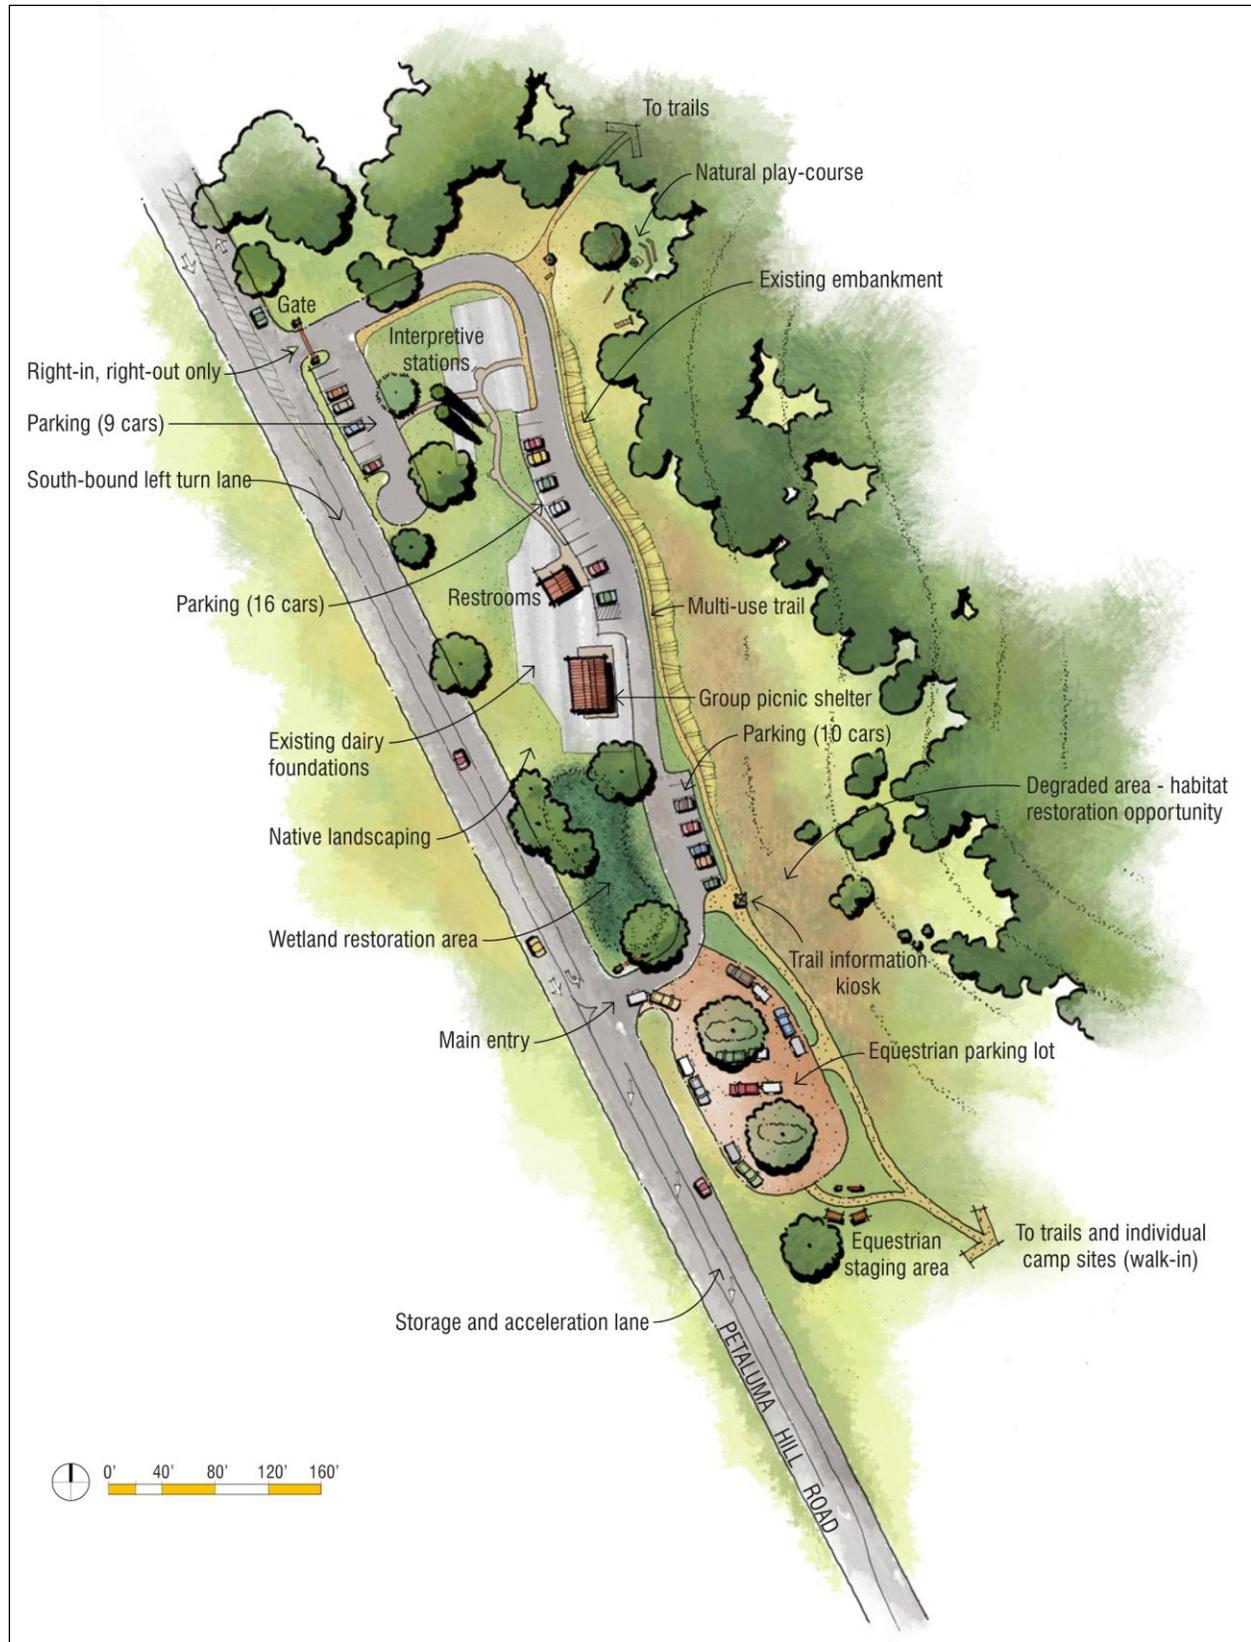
Petaluma Hill Road Staging Area Conceptual Plan
